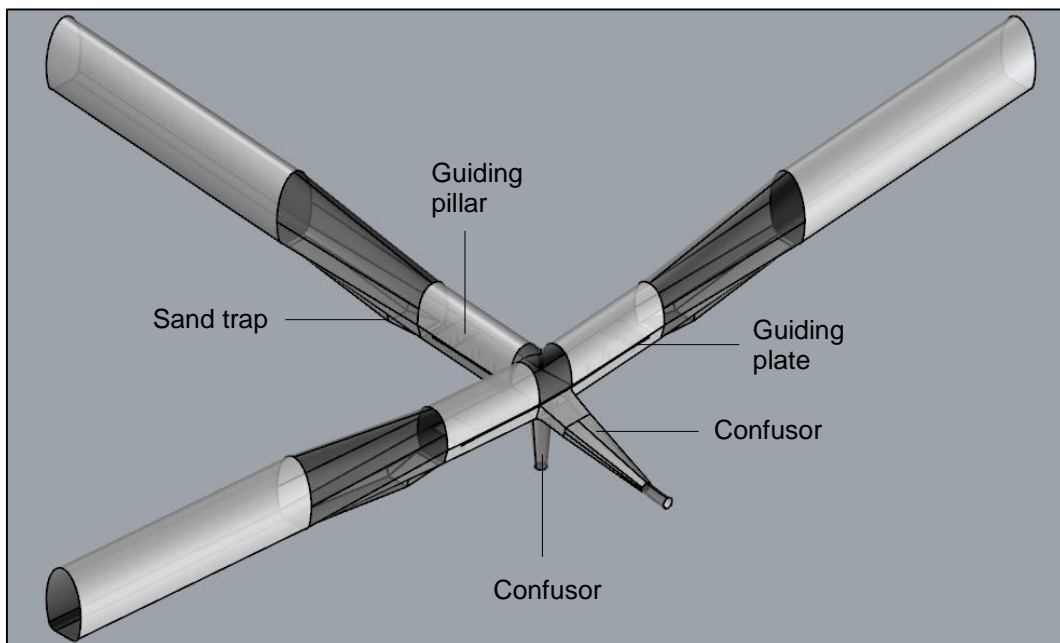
Layout of the intermediate intake for an underground Pumped Hydro Storage combined with heat storage
